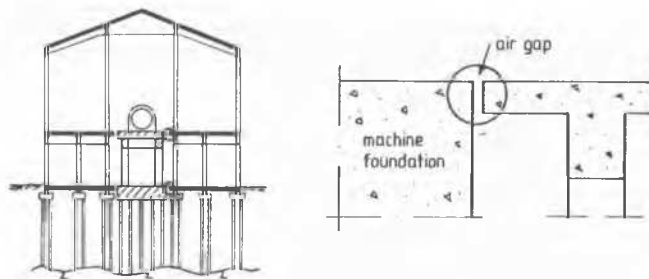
Section of building (left) and detail of expansion joint (right) between machine foundation and floor.
